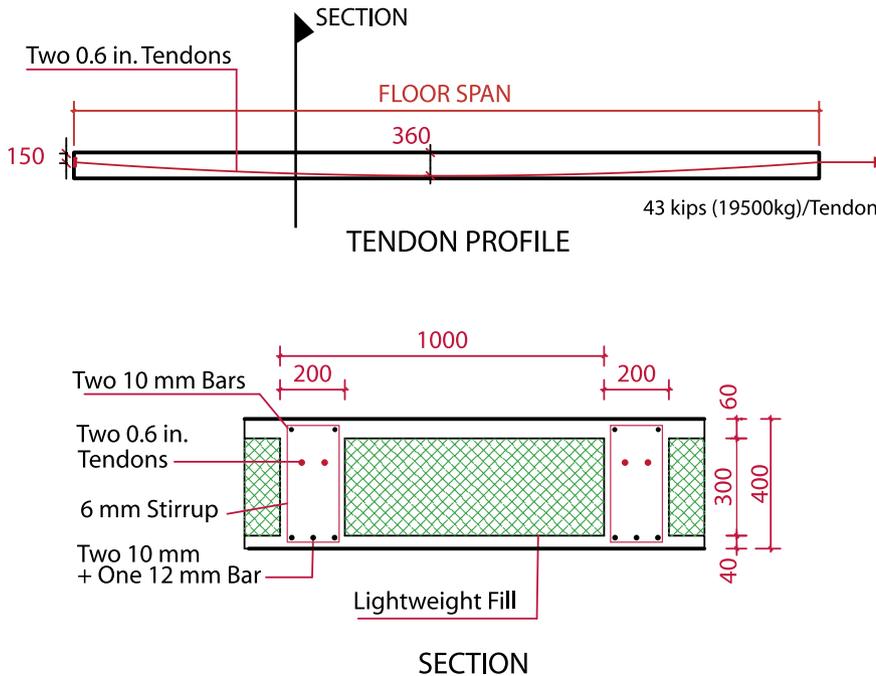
Sections of the 400-mm-thick (16 in.) office module floor plates. Note the lightweight fill placed within the plate to reduce the dead load of the structure. (Dimensions in red are in mm)
